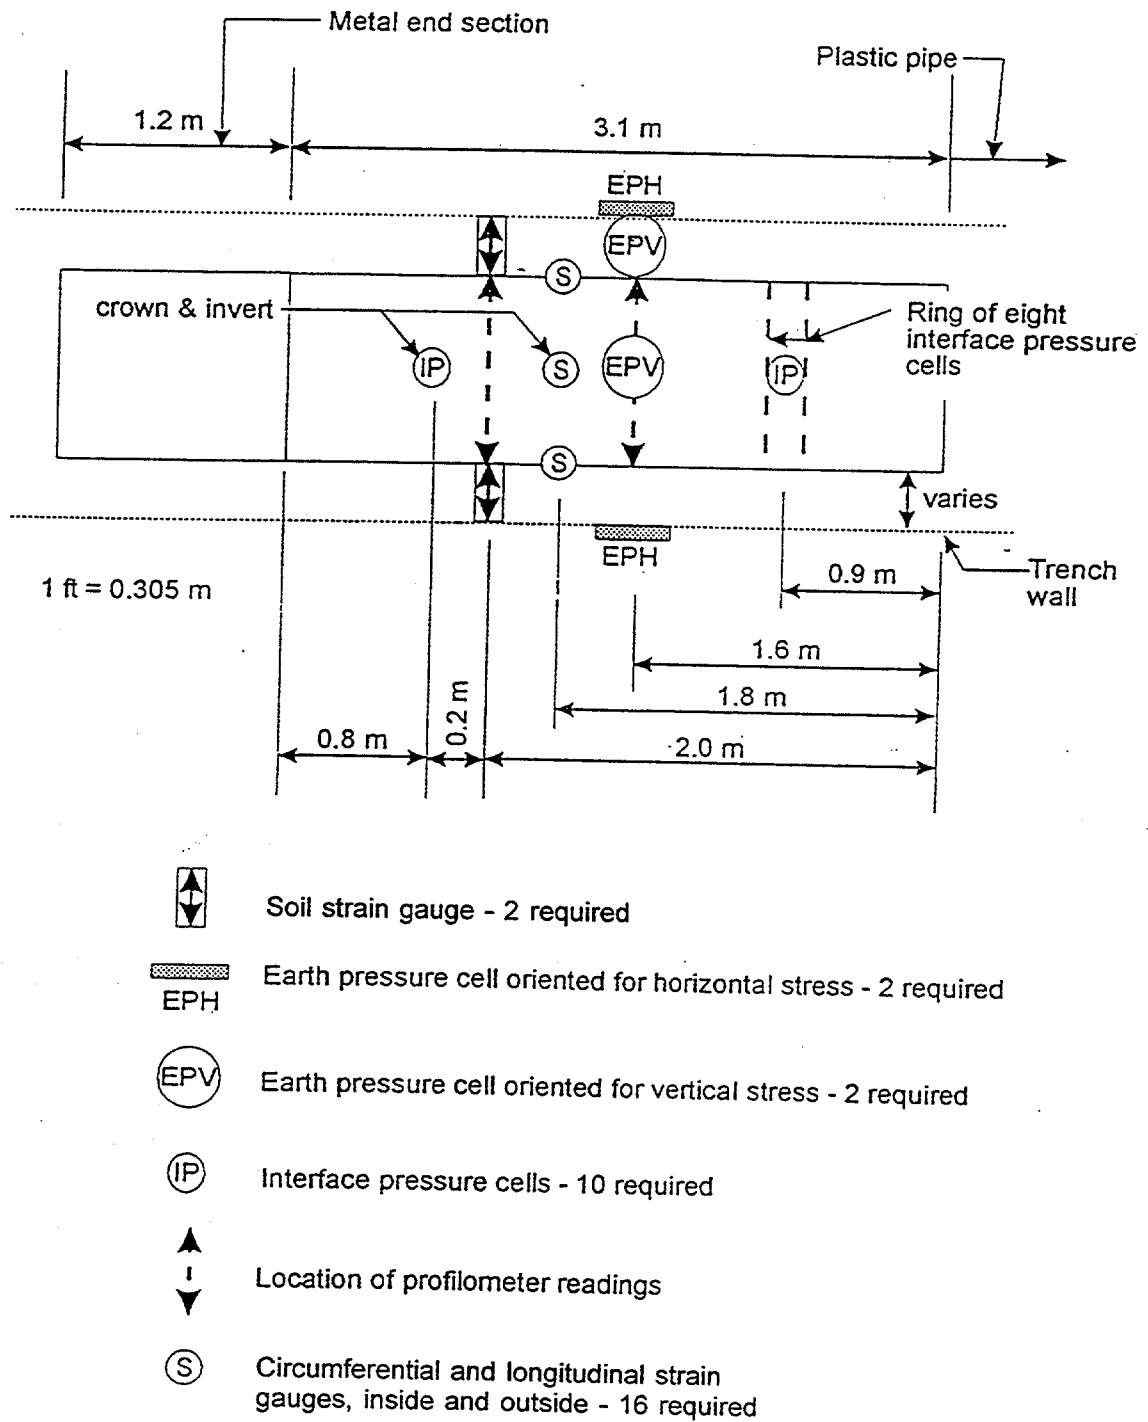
Longitudinal Instrumentation Layout for the Metal Pipe
